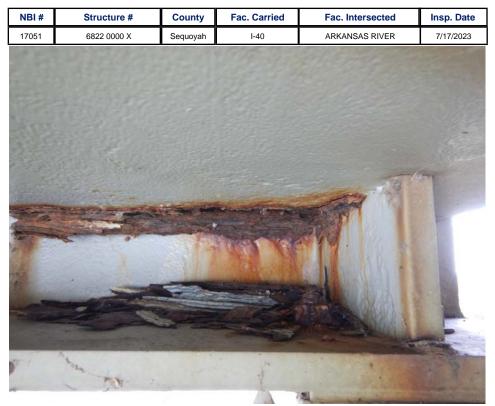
Looking northwest at girder 2, span 12 near floor beam 1. Note: arrest hole through girder web at termination of lateral bracing weld.
